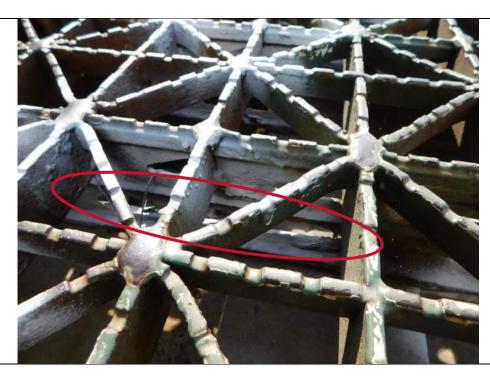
[Span 5] -Detail view of grid deck with corrosion holes in lower main bars above Stringer 16W, typical location between FB6s-7s, Looking North
